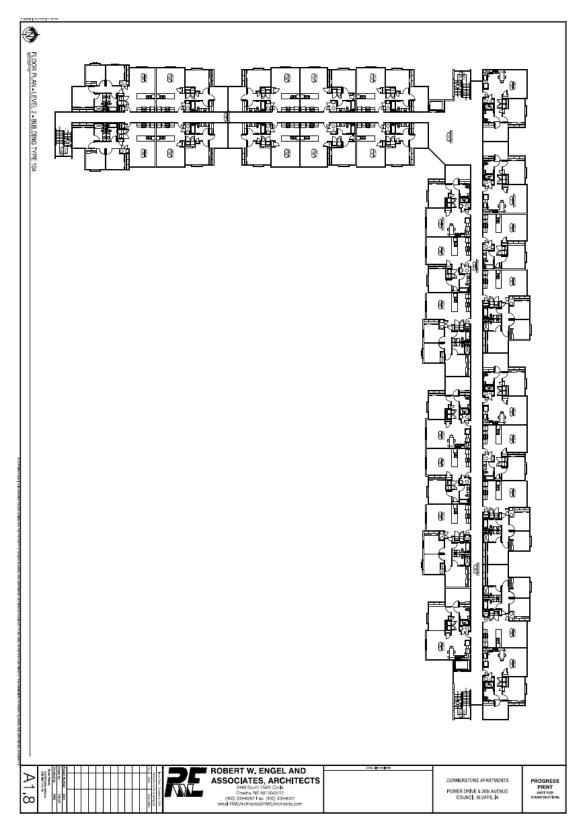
PROPOSED FLOOR PLANS (cont.)
